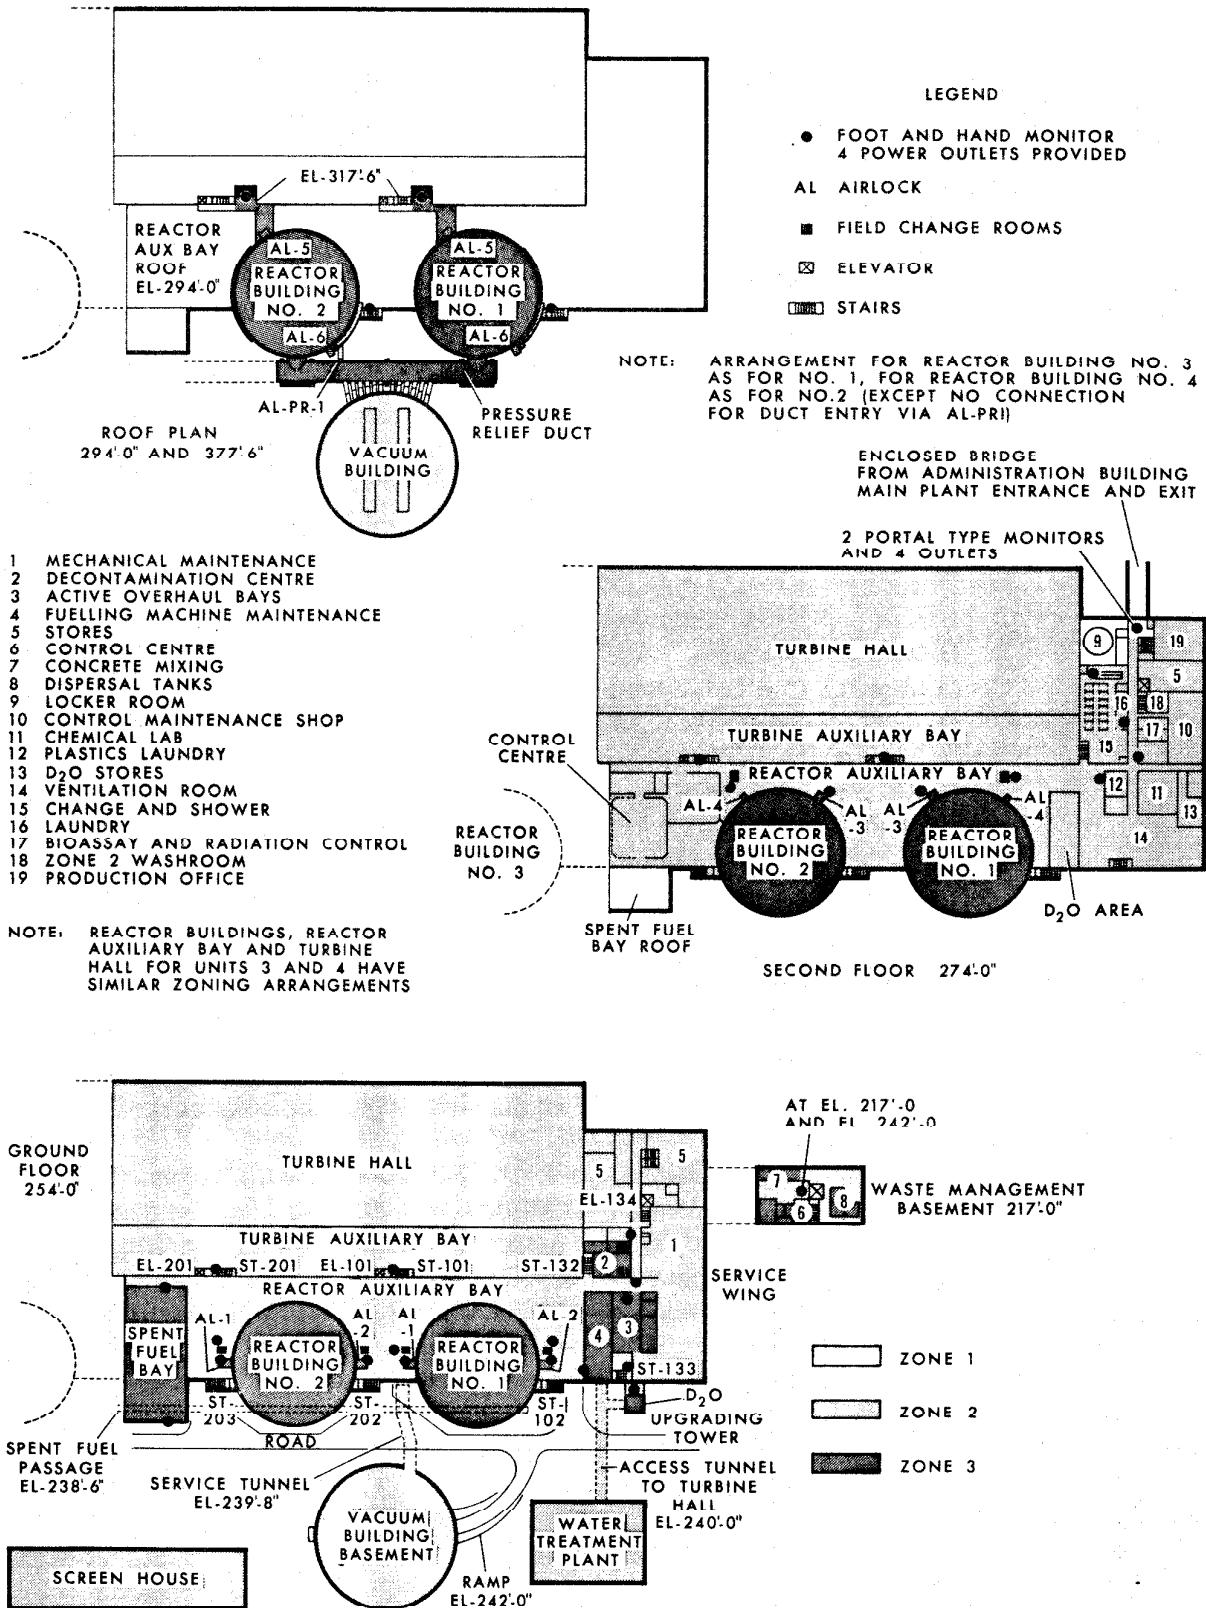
Pickering G.S. - Plant Zoning Arrangement
